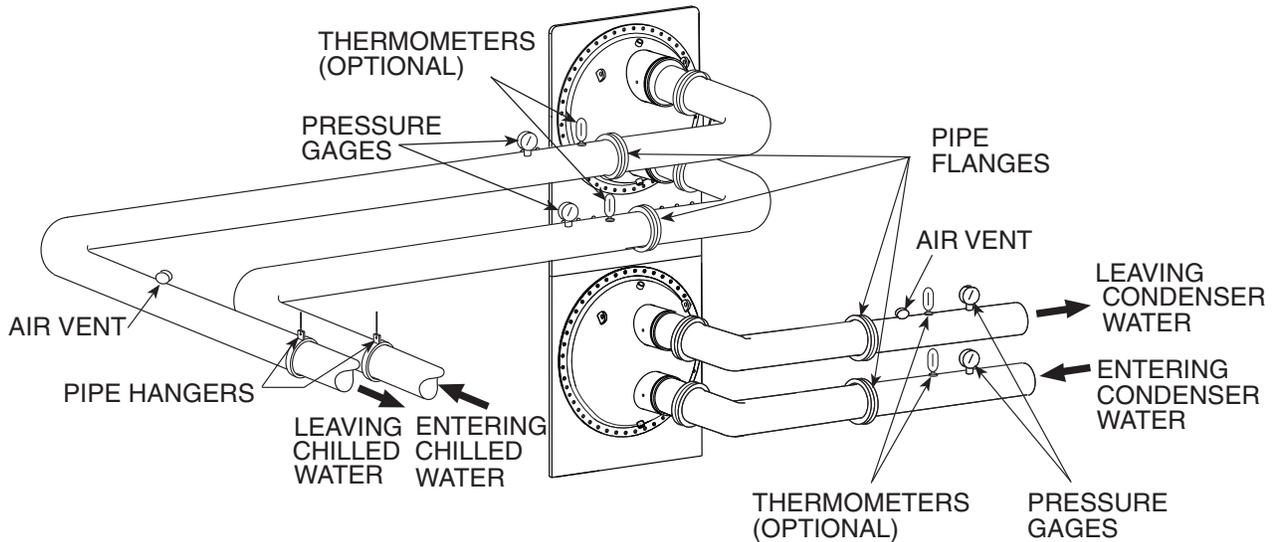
Typical Evaporator and Condenser Piping and Wiring — 30XW325-400
